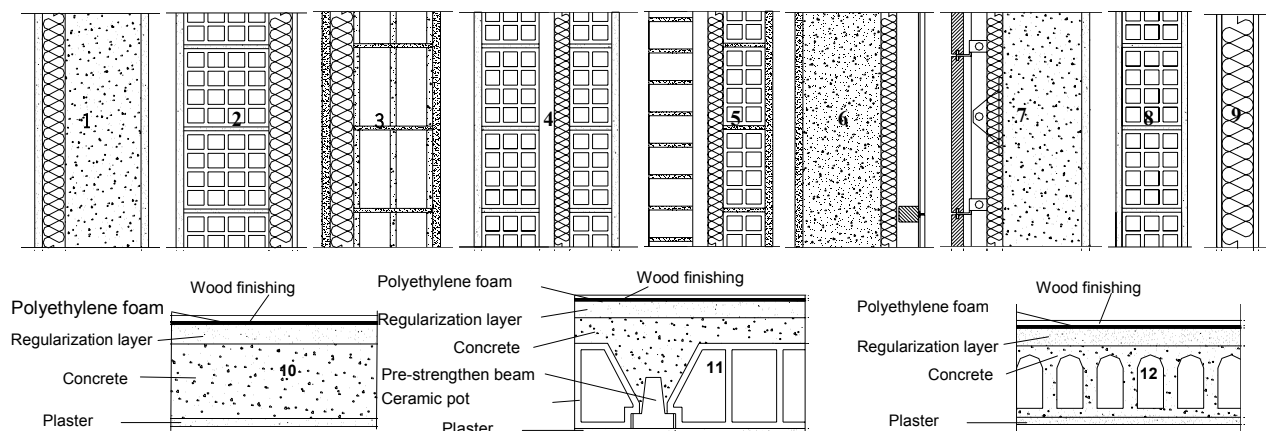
Vertical cross-section of some of the construction solutions of the buildings walls and floors (external and partition elements)
